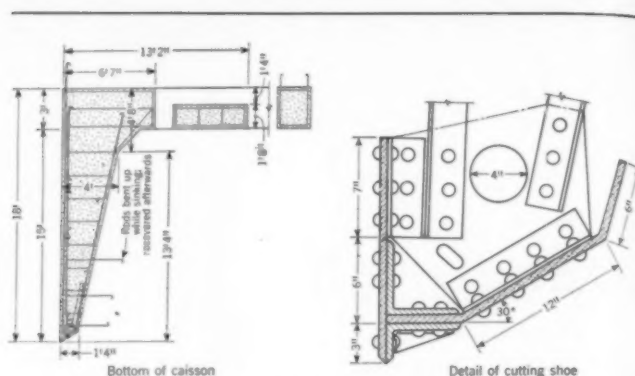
Cutting edge of caisson is steel-faced concrete. After sinking, bottom edge was thickened to form foundation.
